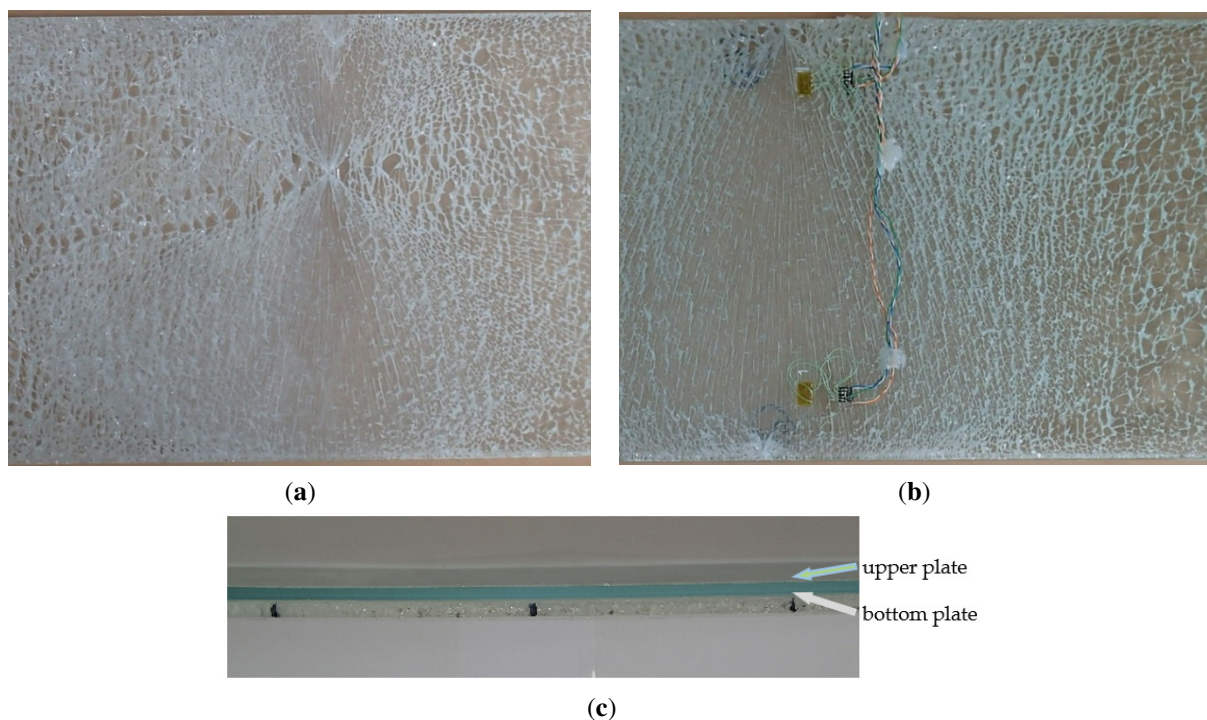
Photography of fracture patterns of specimens: (a) S1; (b) S3; and (c) side view on centre of LG pane [12]
